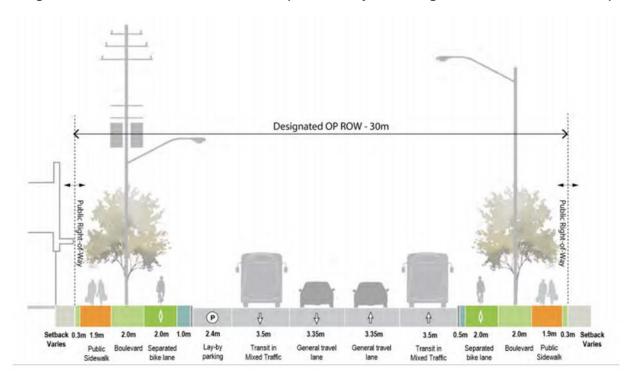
Preferred ROW Alternative (Clarkson Road South to Meadow Wood Road)
